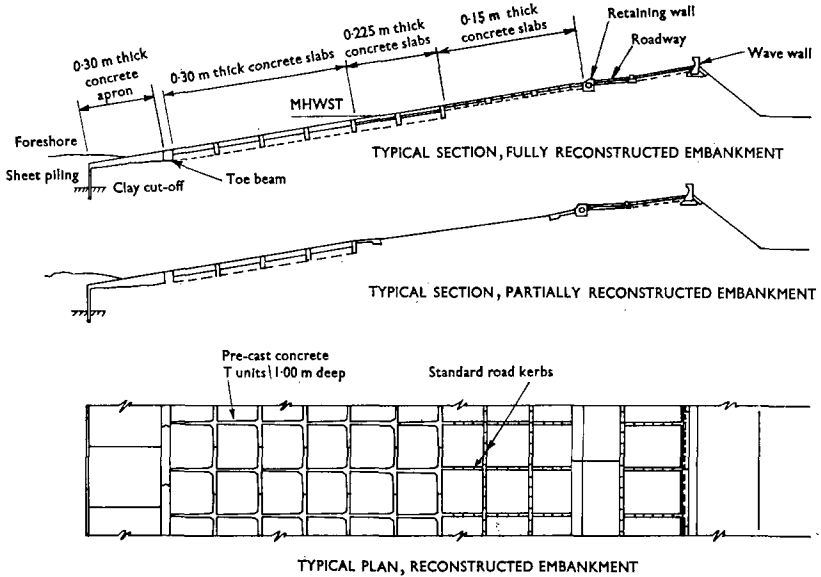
Typical plan and cross-section for stage II of reconstruction
